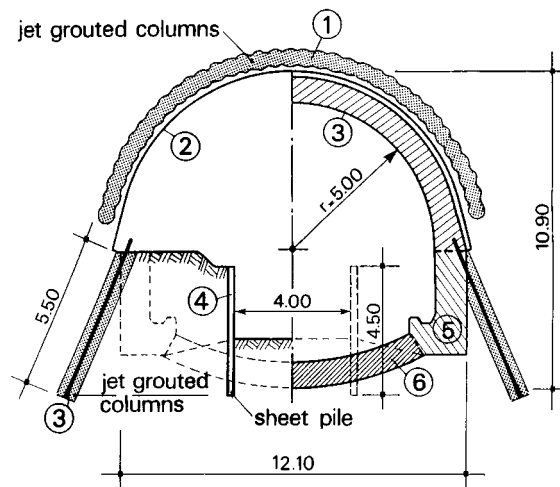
Steps 1–6 of the tunnel construction sequence in the sand deposit
